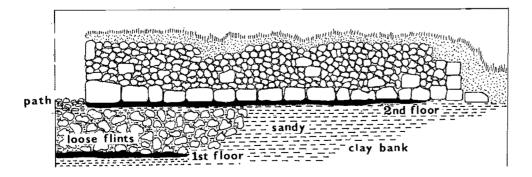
Boundary walls, with section at face of Wall X, showing the corner with Wall W built over a flint filled pit or a destroyed building.
